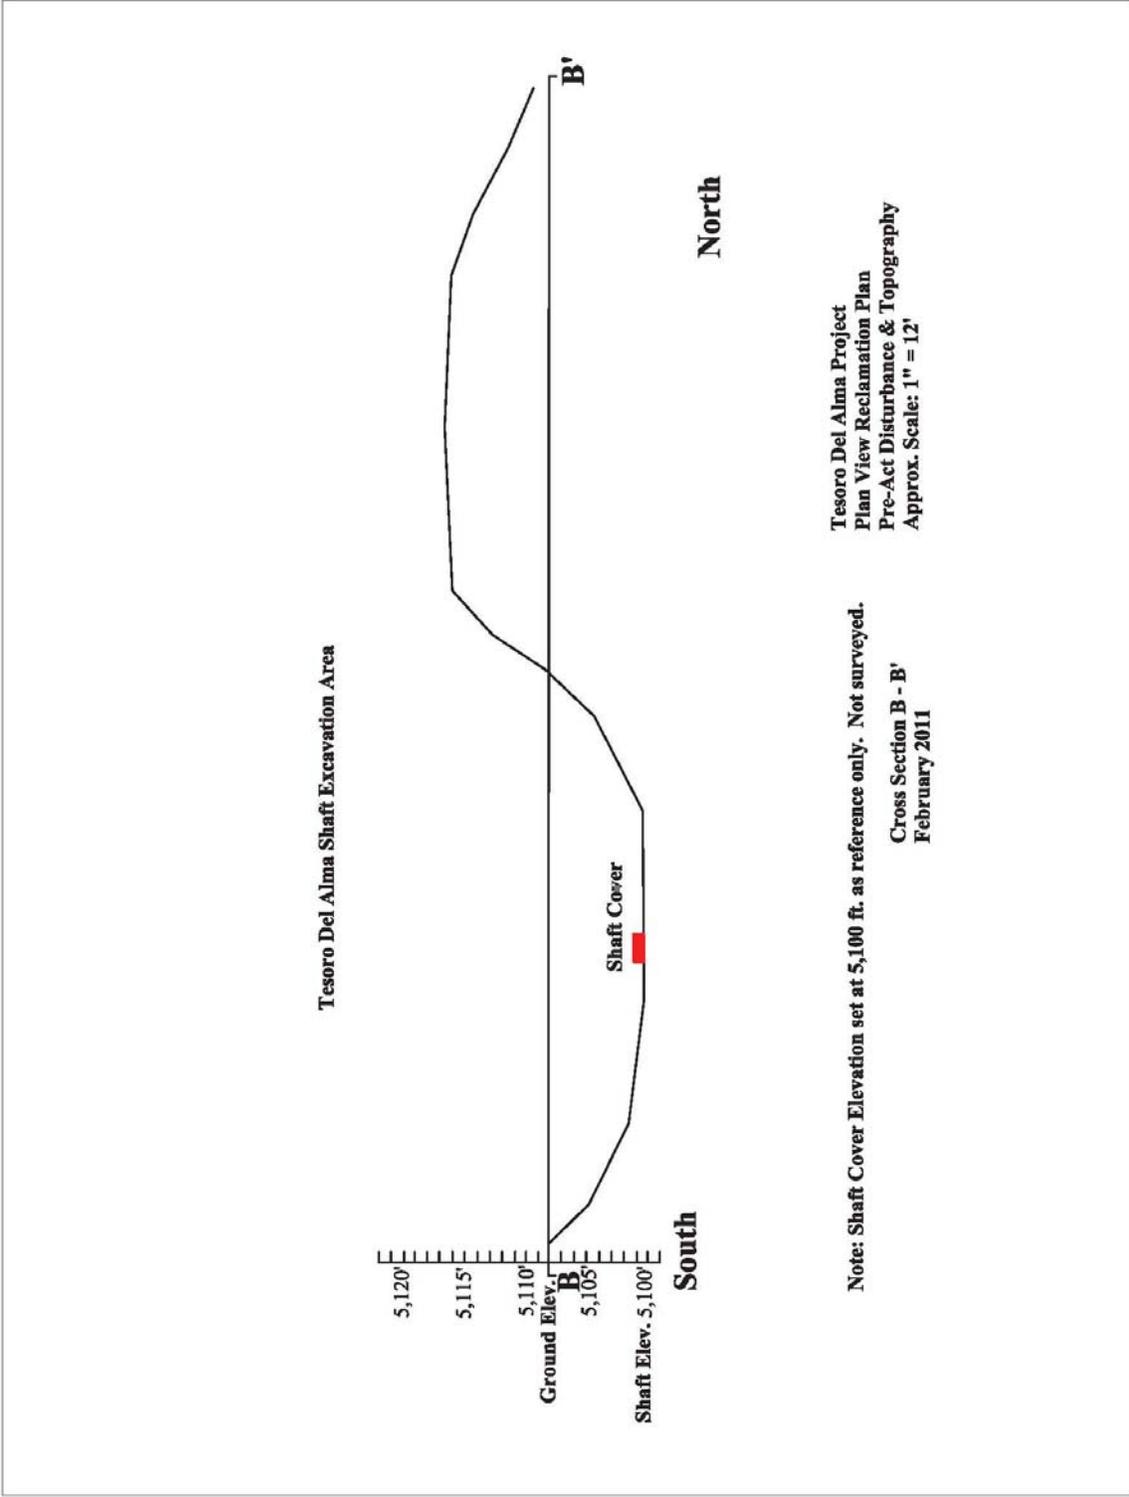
Shaft Excavation Area in Cross Section at 5,100 ft.
